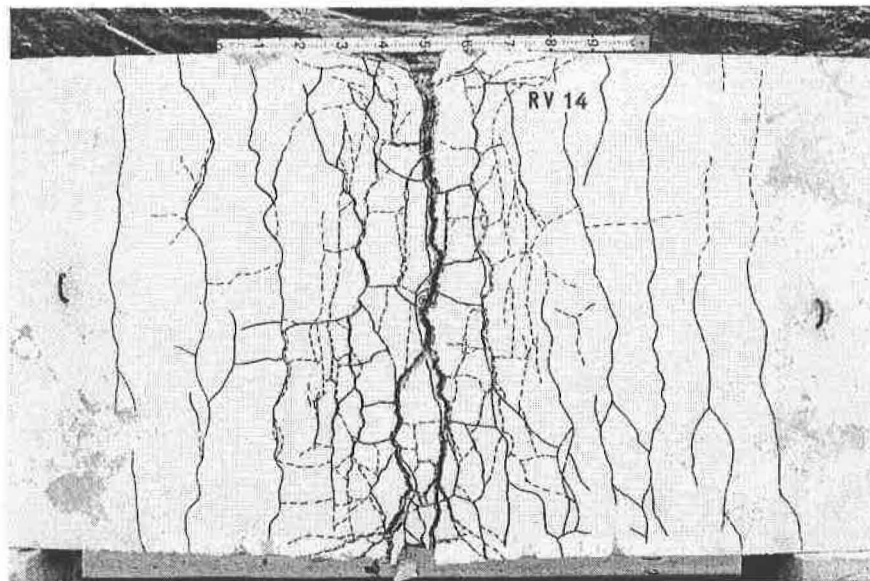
Final crack pattern of specimen RV14. Top view.
